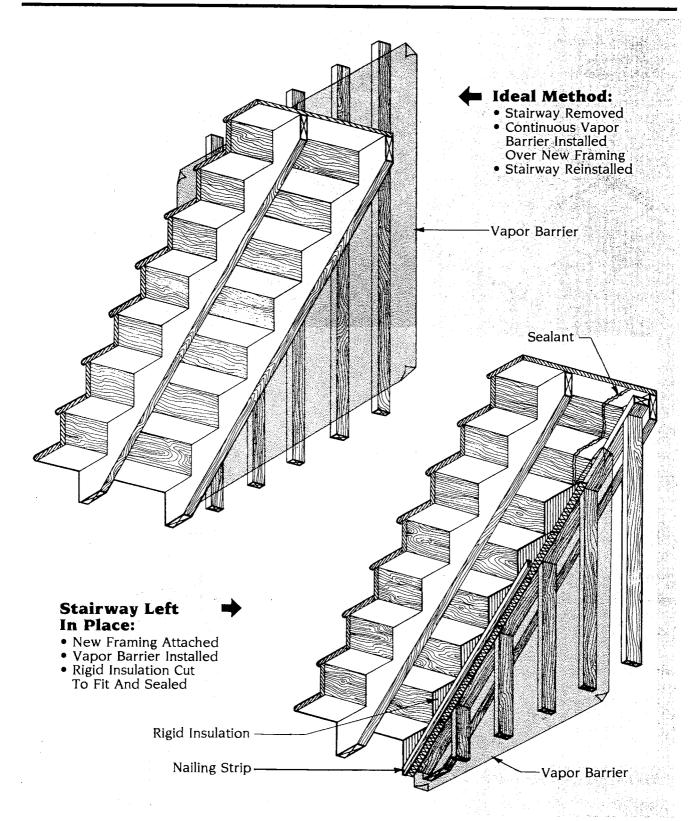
Installation of vapor barrier at stairway. (Underside view of stairway is shown.)
